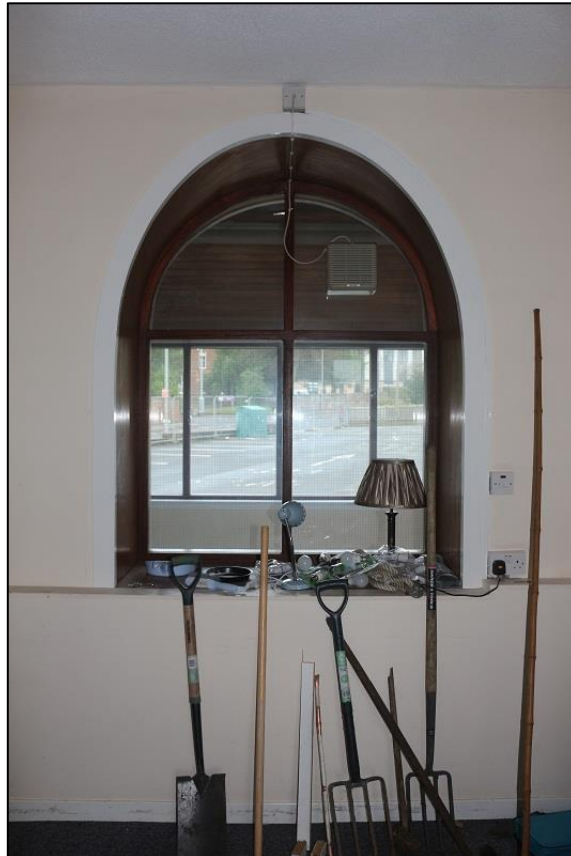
Occupational Health Building – Possible Doorway in E Wall
